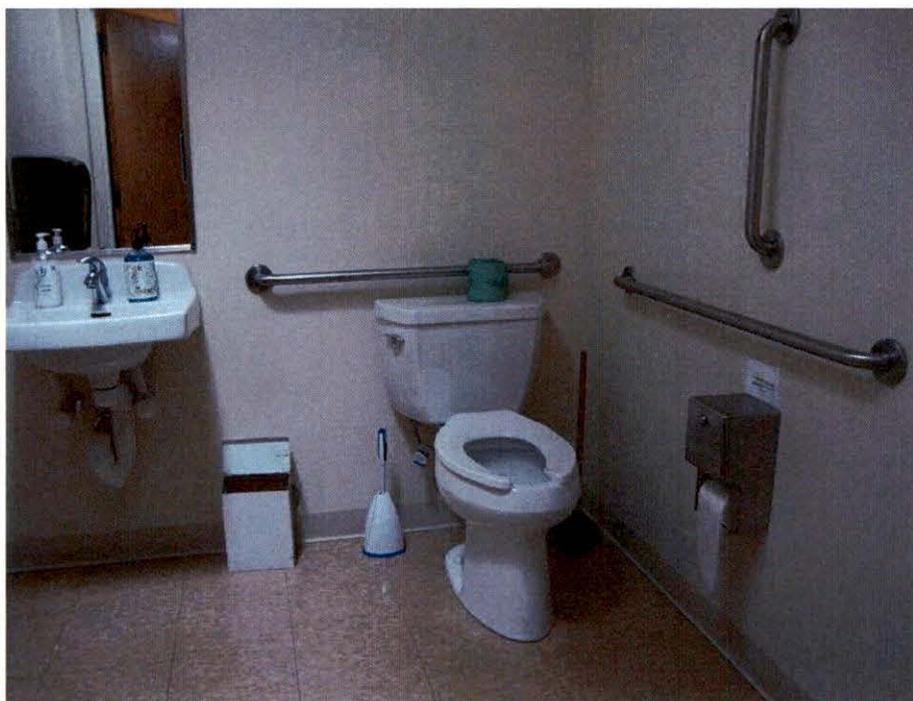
Accessible restroom at 1659 Merrimac Trail.
